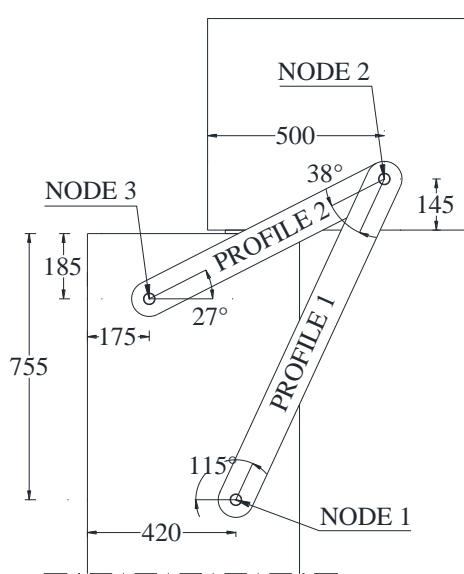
Connection system configuration (dimensions are expressed in mm)
